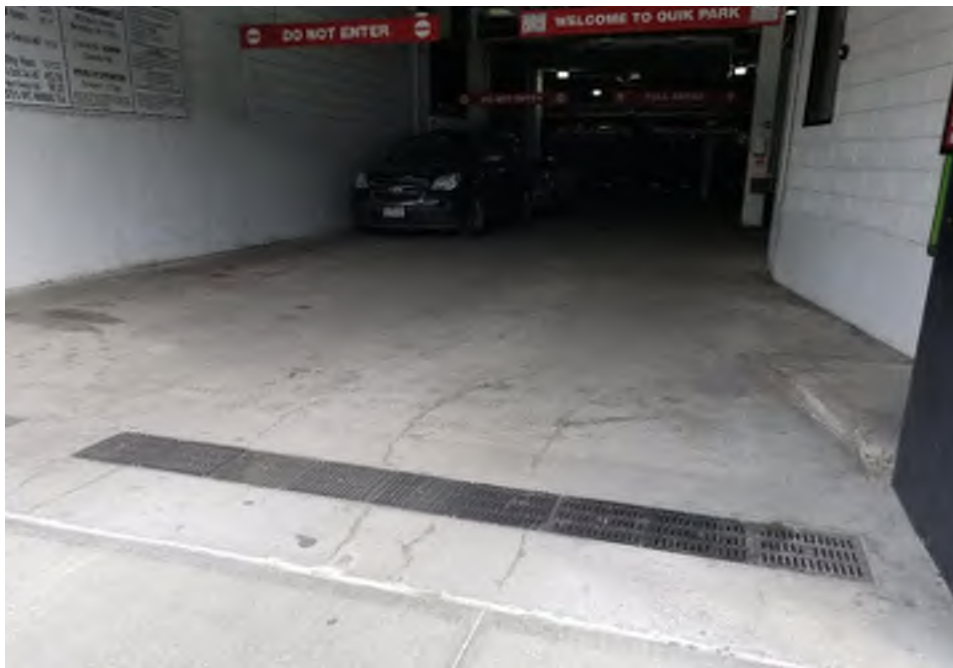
Paved esplanade area, facing southeast. 27 February 2019.
